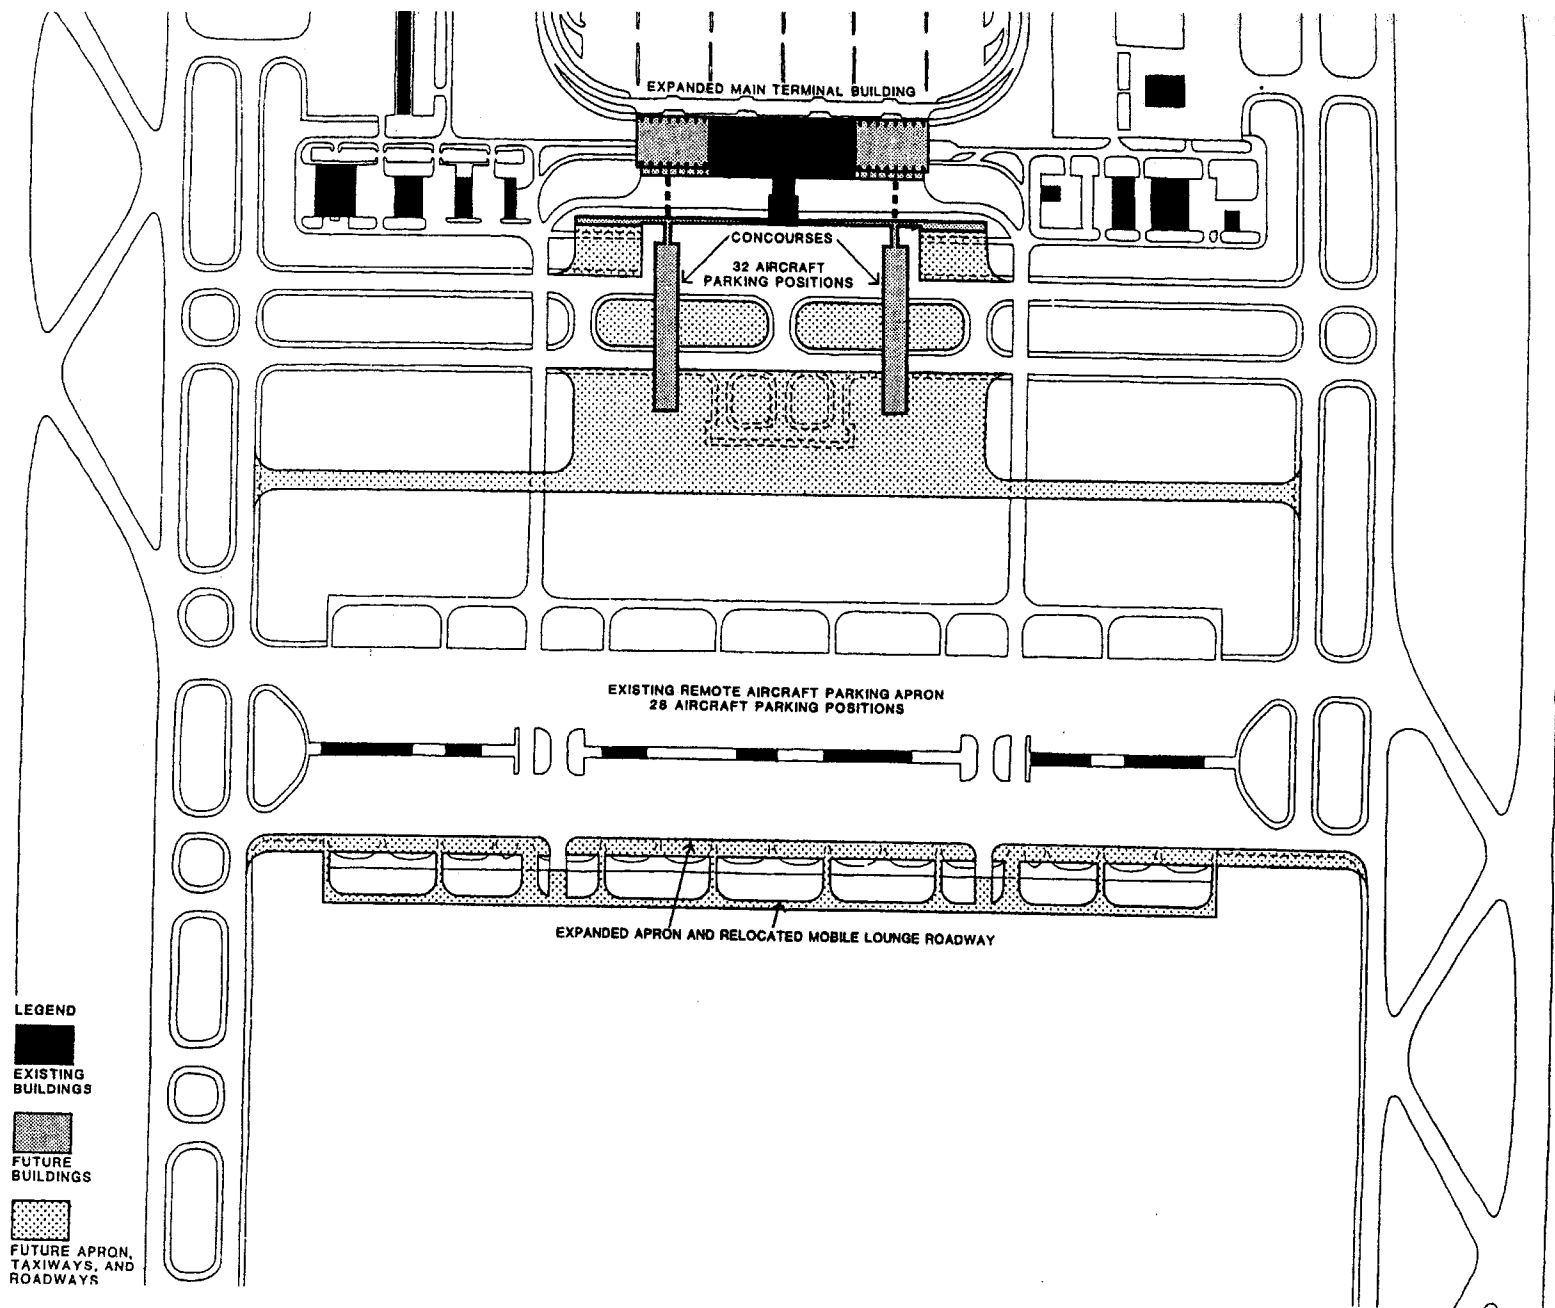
Washington Dulles International Airport Master Plan (1985): Terminal Concept B.
